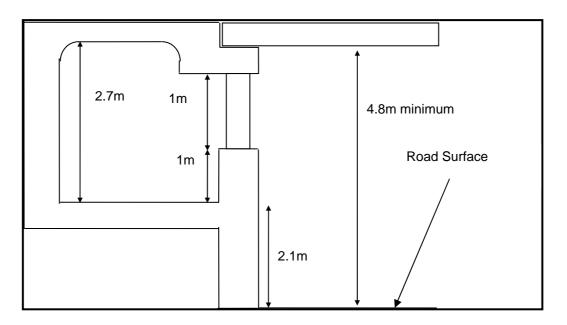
Indicative Cross Section through RC walkway at Botley Road
